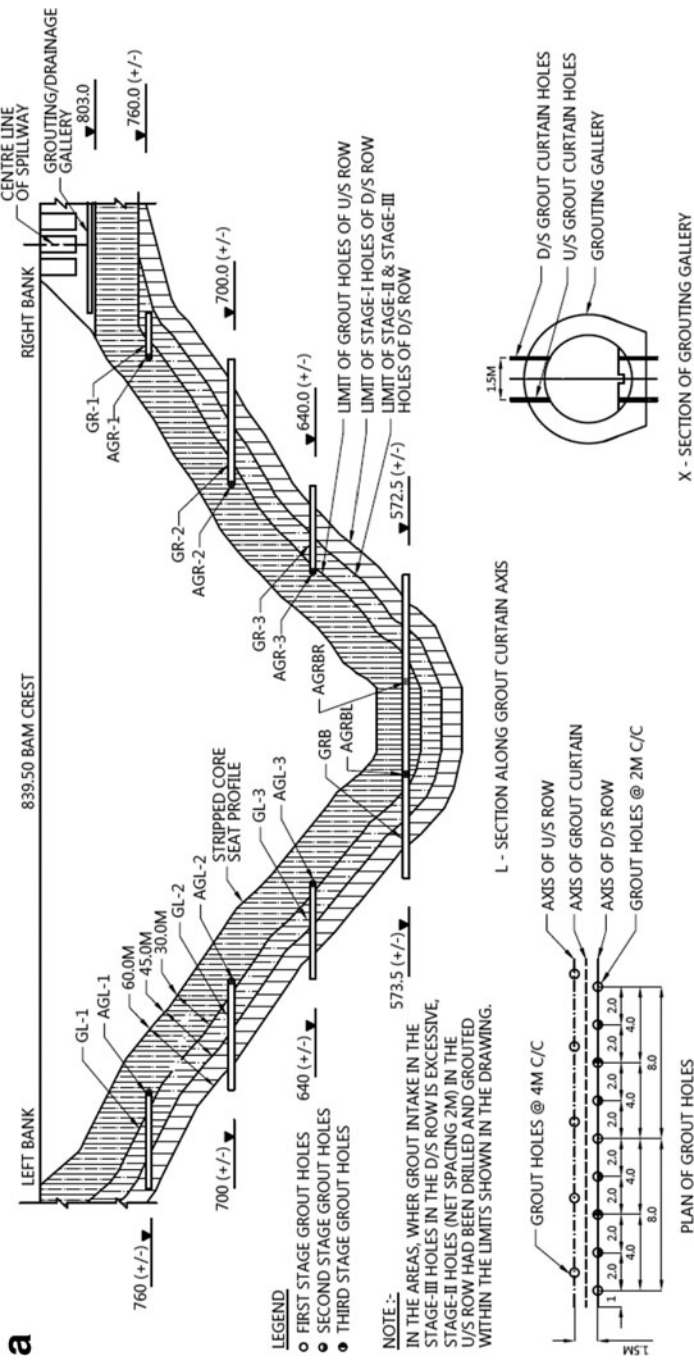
(a) Curtain grouting at Tehri Dam.
